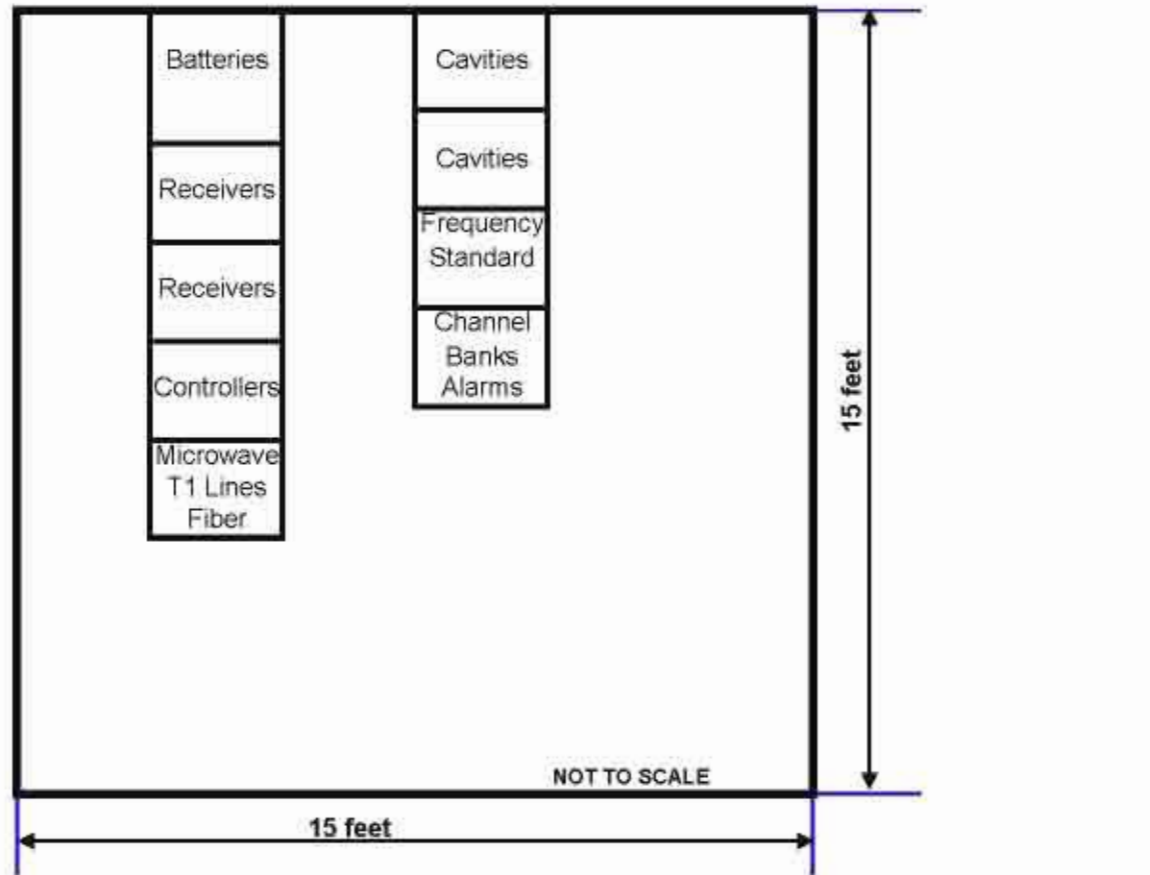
TRUNKED REPEATER SITE FLOOR LAYOUT
